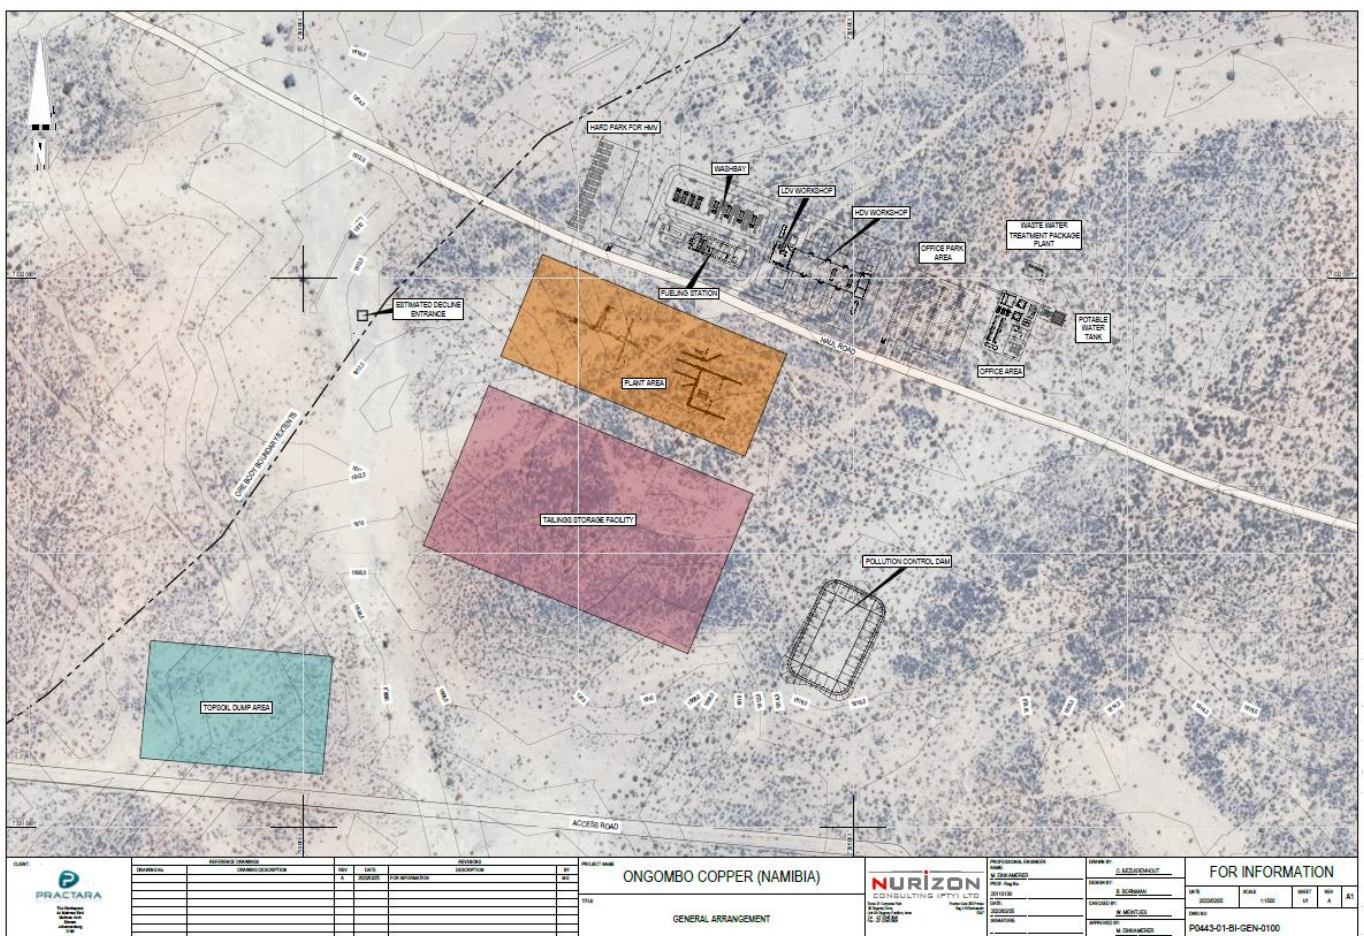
Proposed site layout including underground mining areas (decline entrance)
